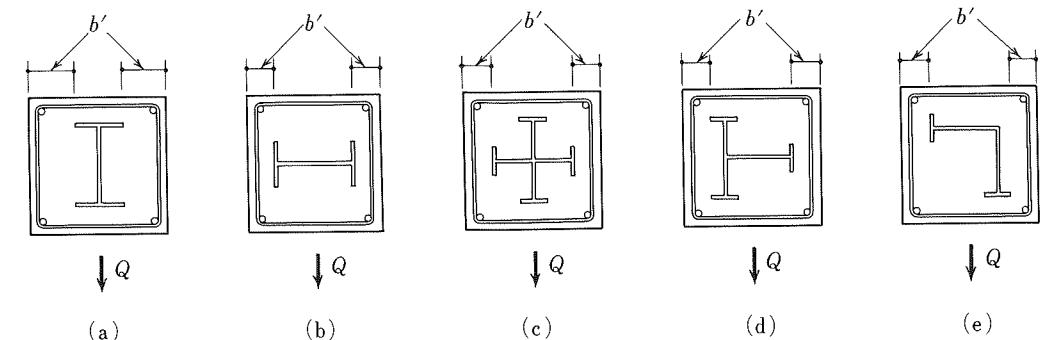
Effective Concrete Width  $b'$  at Steel Flange of Column
